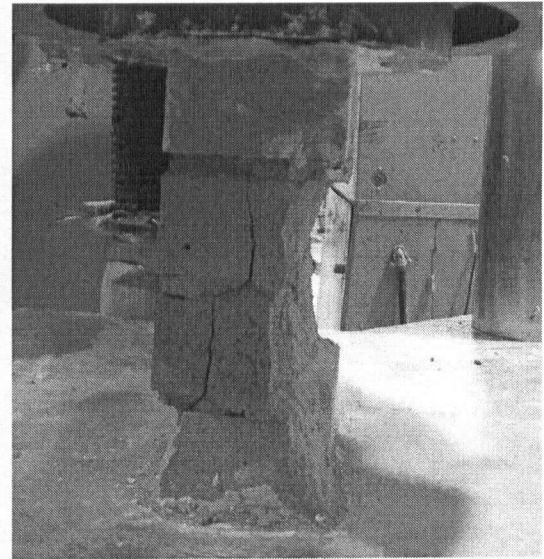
Typical Masonry Unit Compression Failures
